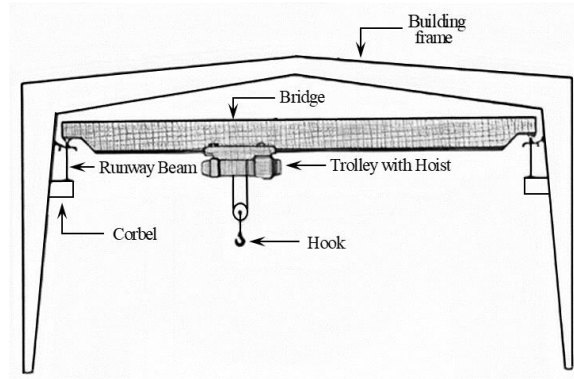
Top Running Bridge Crane with Suspended Trolley [3].
